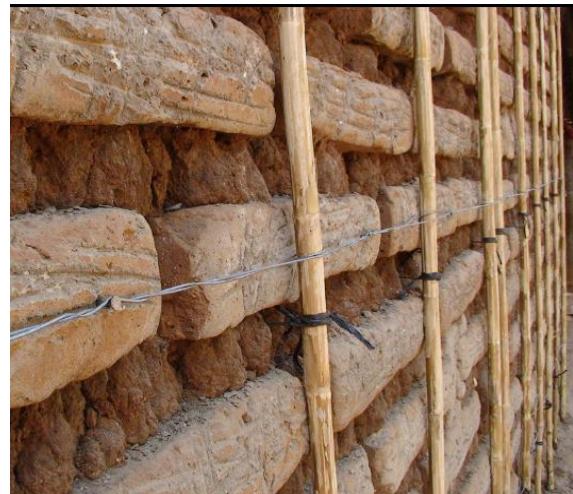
Construction procedure of bamboo reinforcement (source: www.wuakesafeadobe.net)
